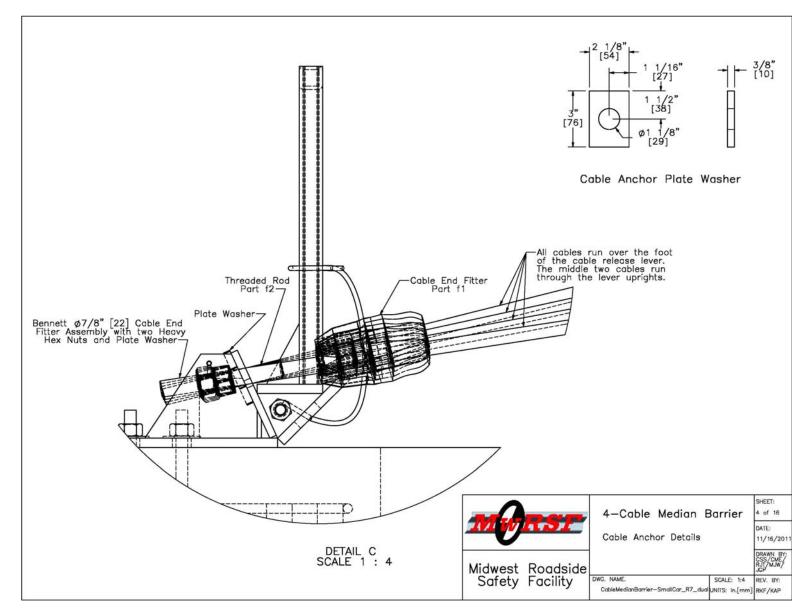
Cable Anchor Details, Test No. 4CMB-2
